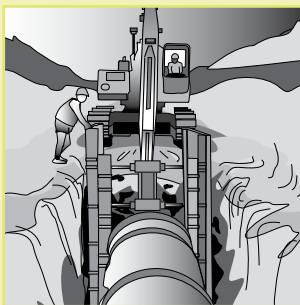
Example of a section of trench shoring extending above the excavation for fall protection.
